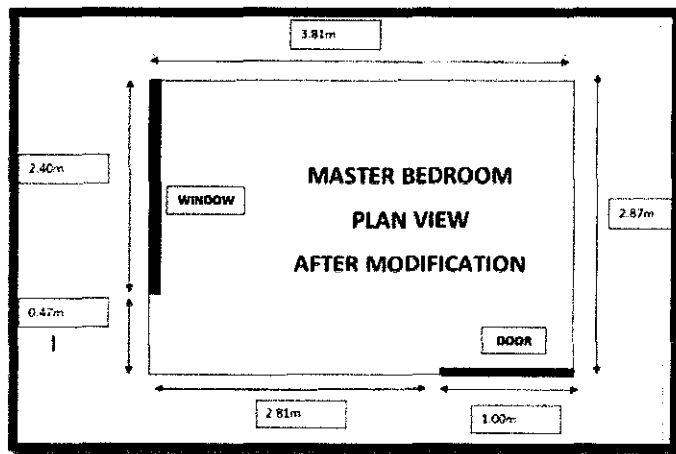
Master bedroom's plan view and dimension after modification (Increase window's width)
